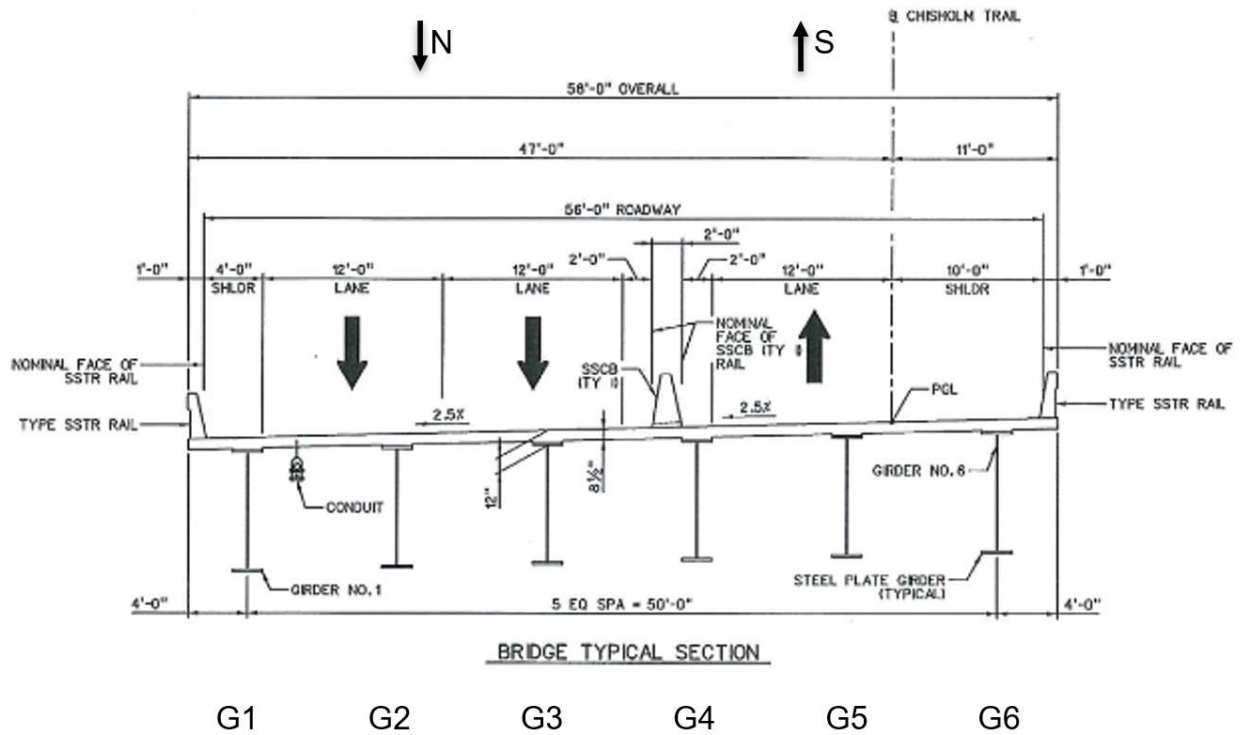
Chisholm Trail Bridge Typical Transverse Section
